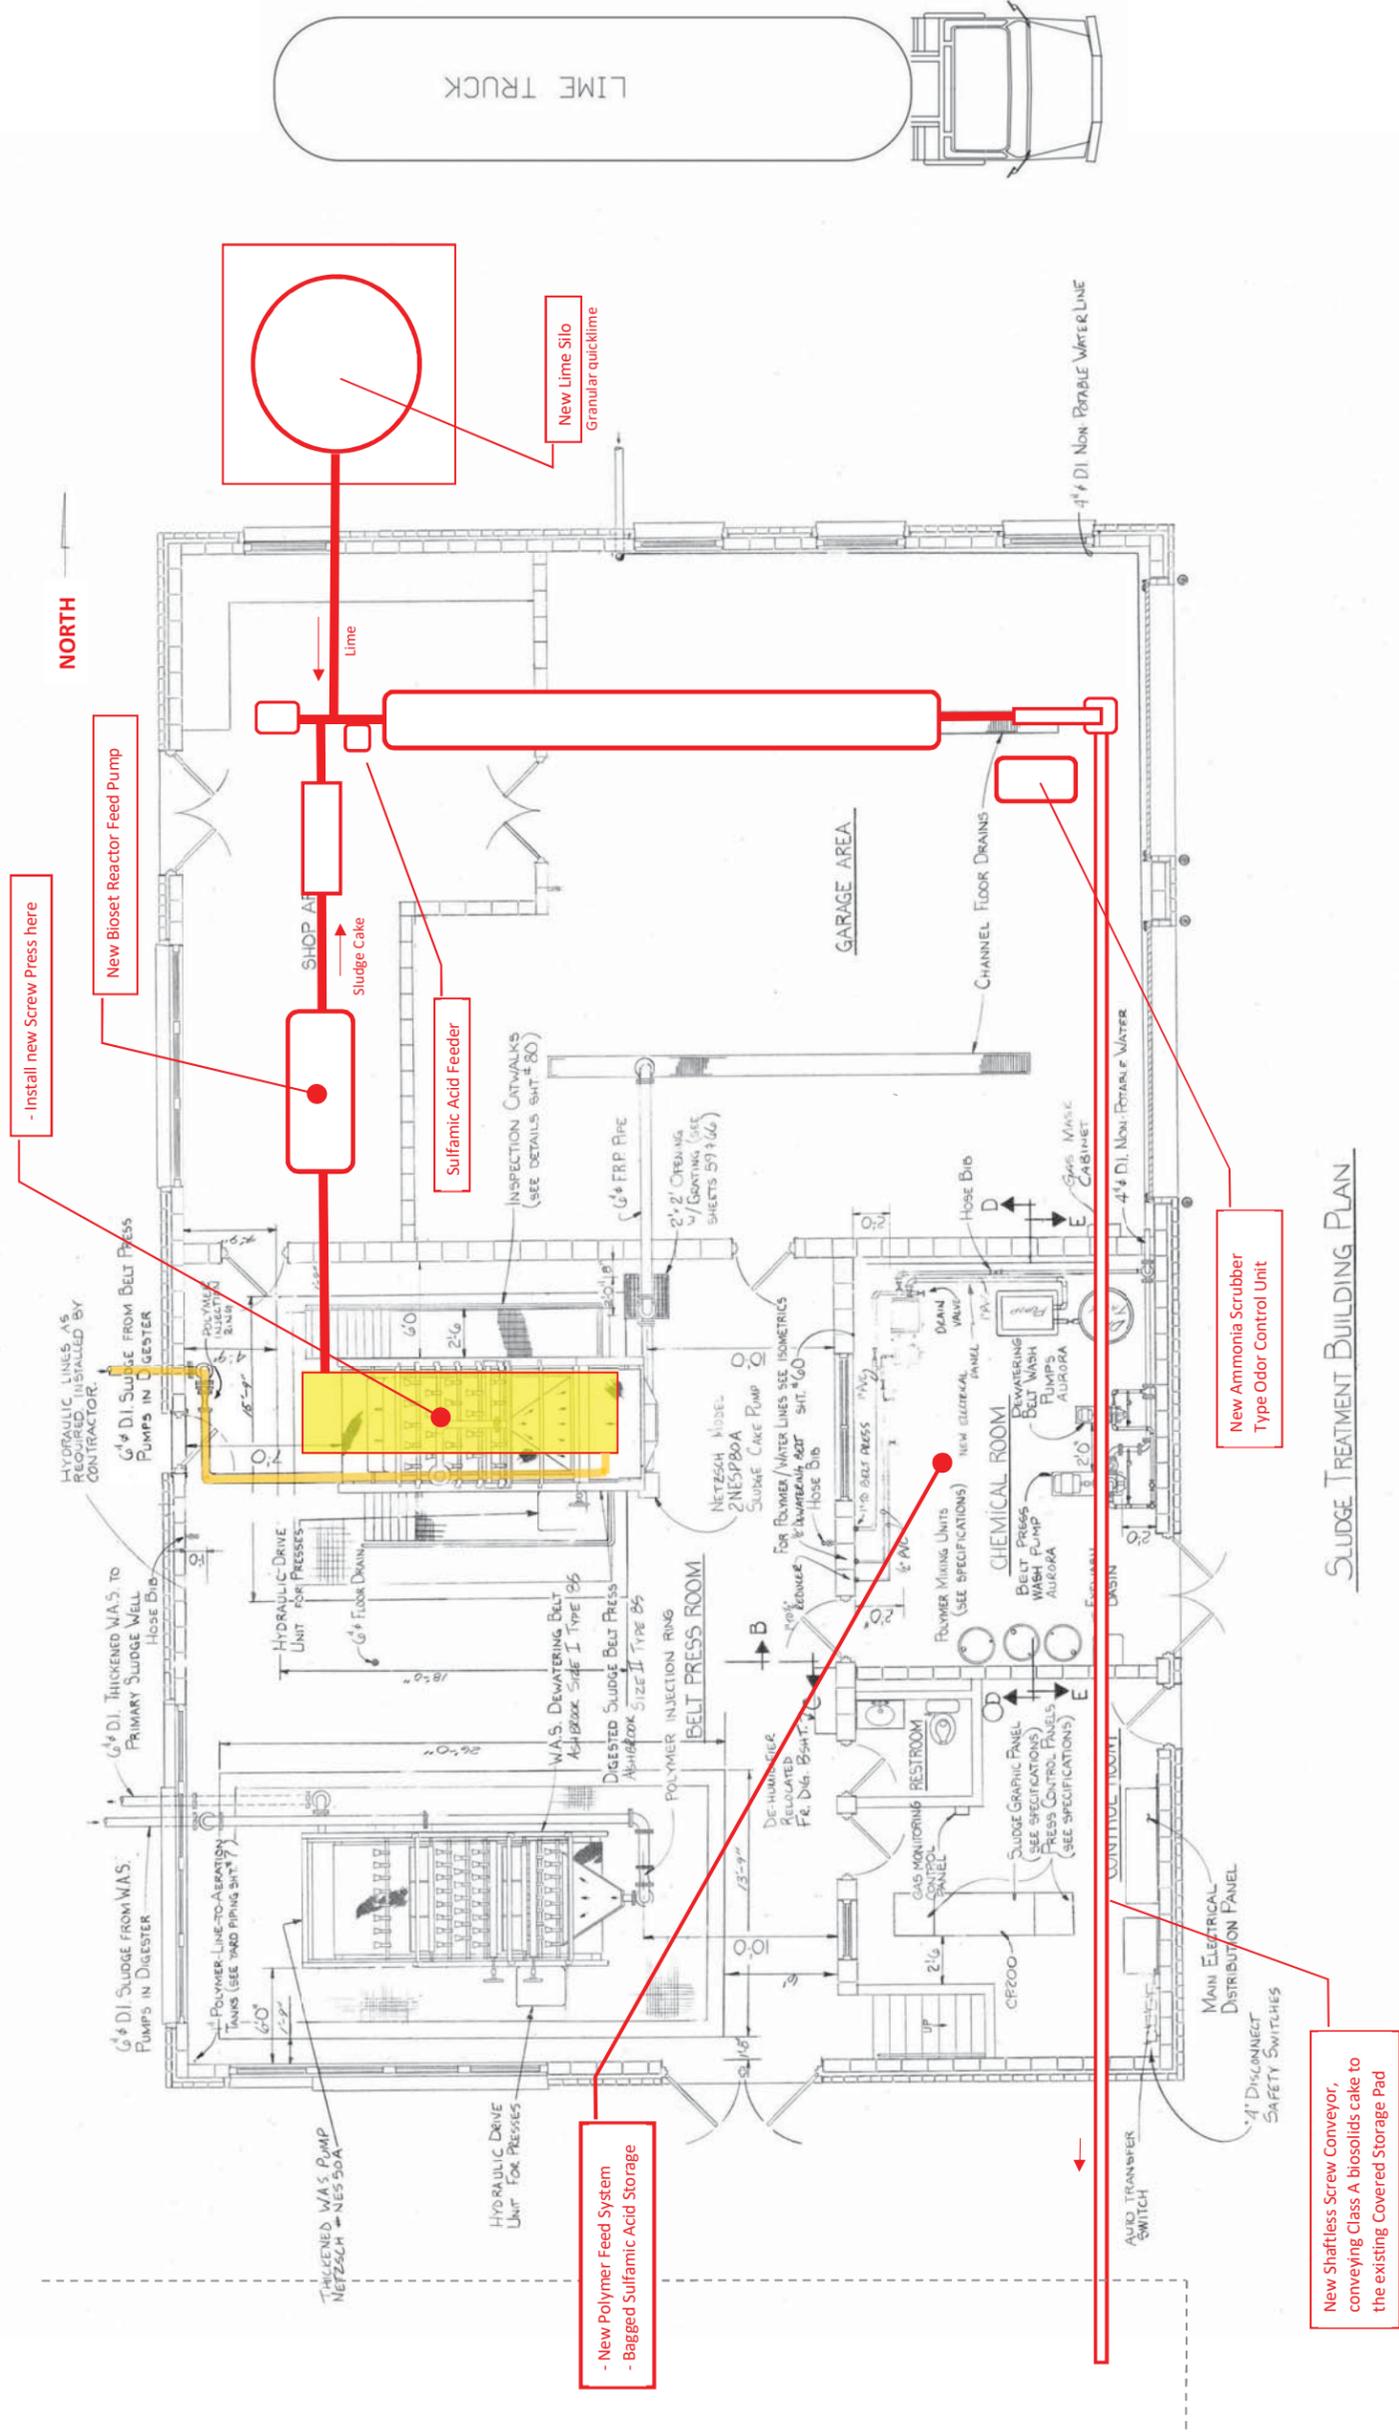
provides a conceptual layout of the Bioset reactor installation inside the existing Sludge Treatment Building.
